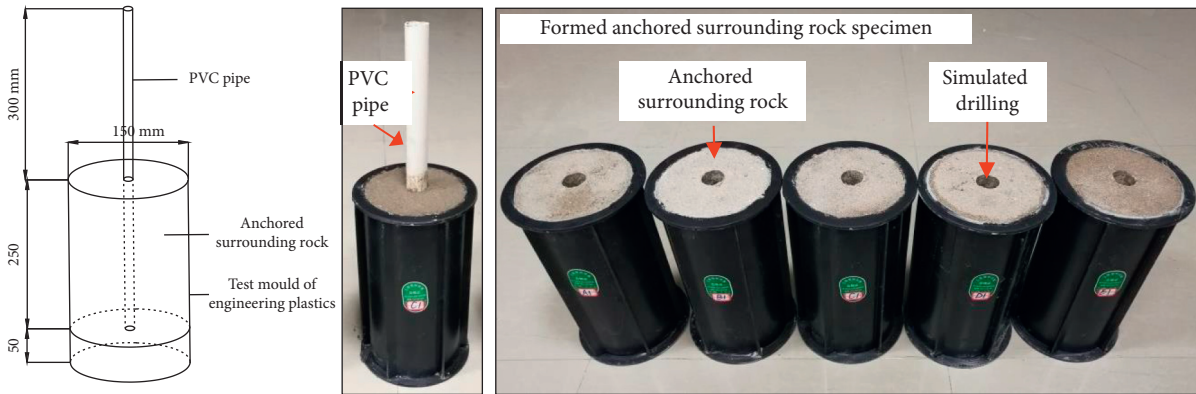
Specimen preparation of anchorage surrounding rock.
